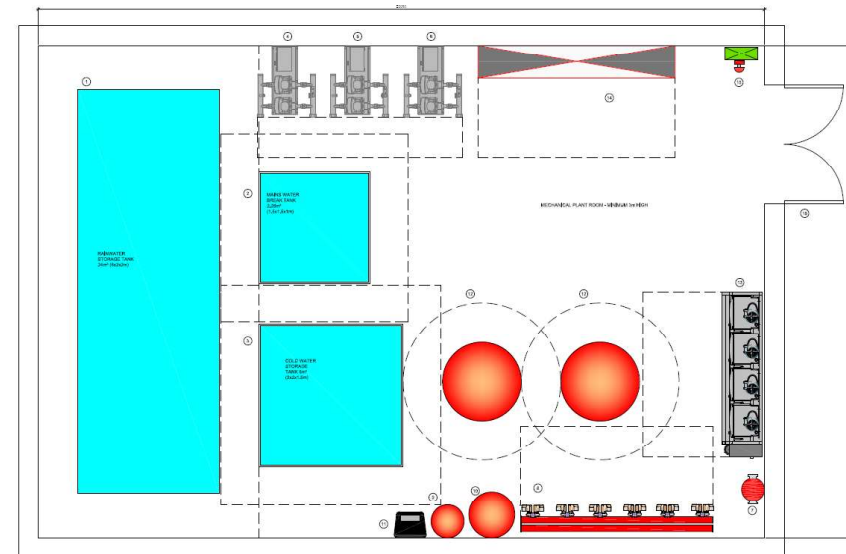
Typical Office Building Ground Floor Plant Area
